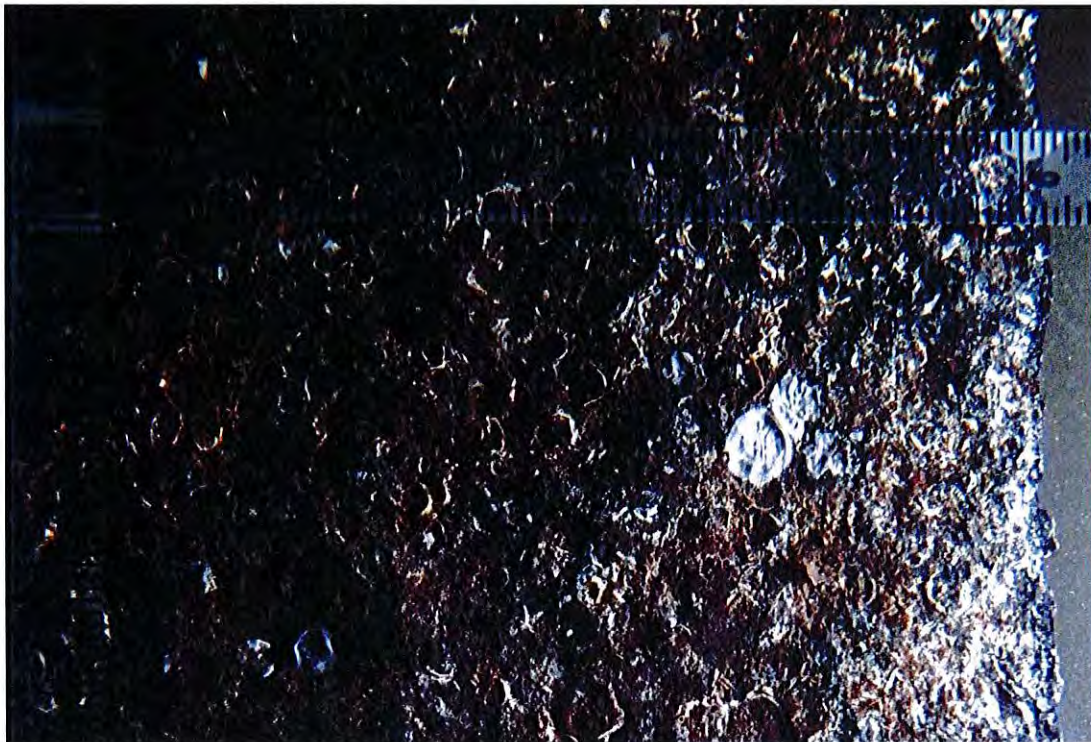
Typical condition of the flange face of a H-pile graded Severe. H-pile location at Bent K-bar and Pile Row 16-bar South.
